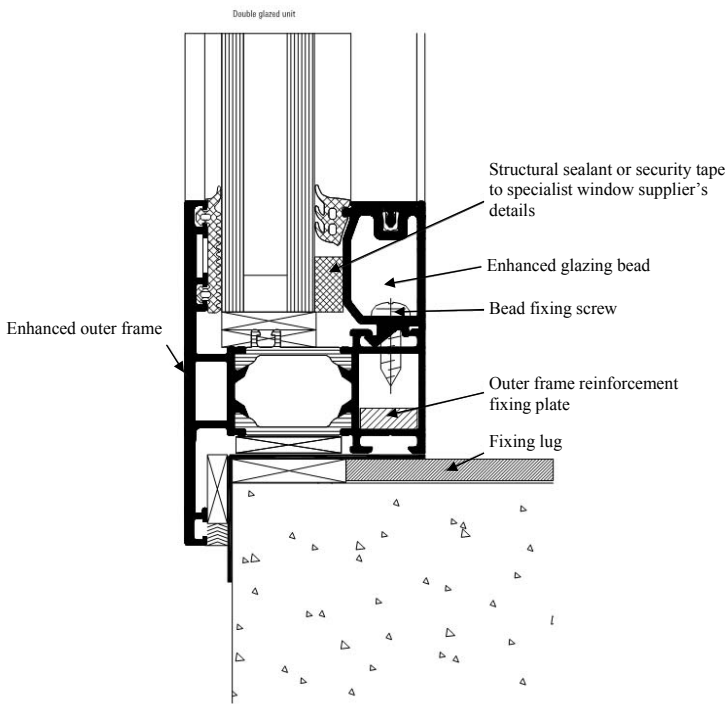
Example of aluminium profile section for outside edges of opening (Taken from Schuco AWS 66E specifiers guide)
